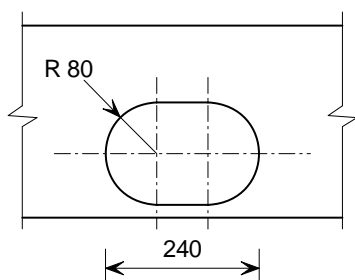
Dimensions of service openings in side wall of RHS sections
